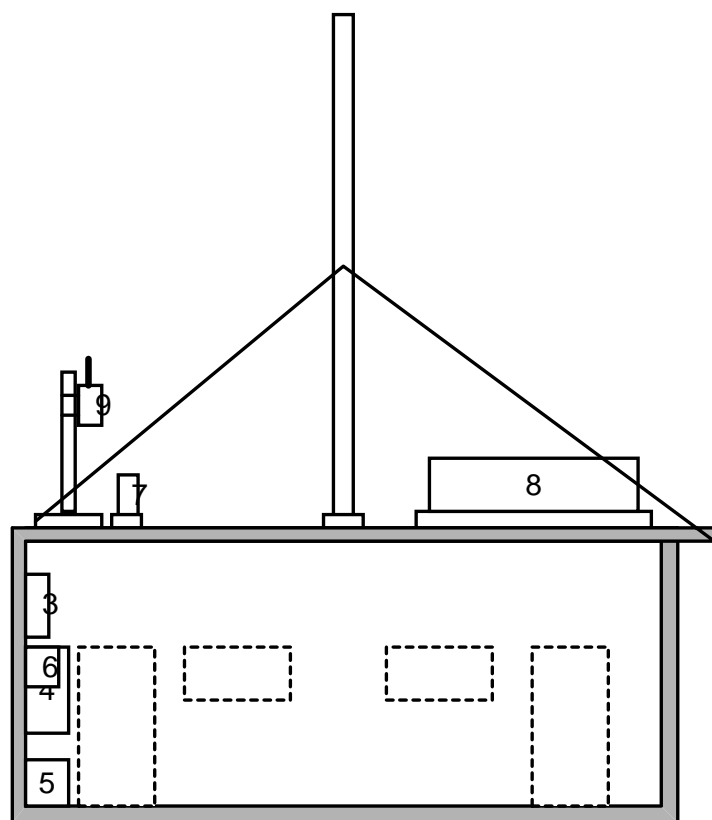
EQUIPMENT LAYOUT PLAN AND
